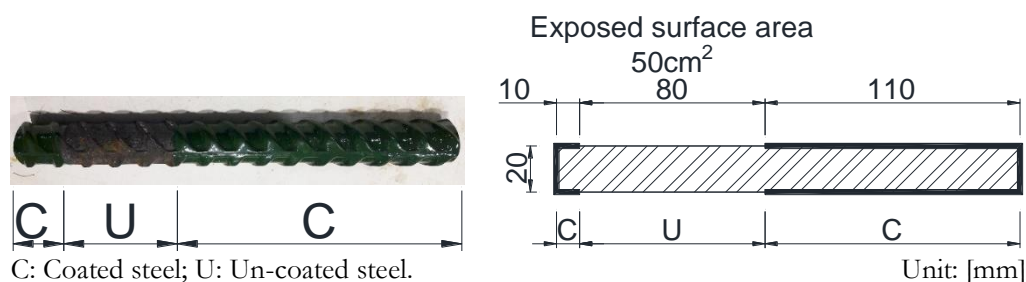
Preparation of steel bars embedded in the concrete specimen.
